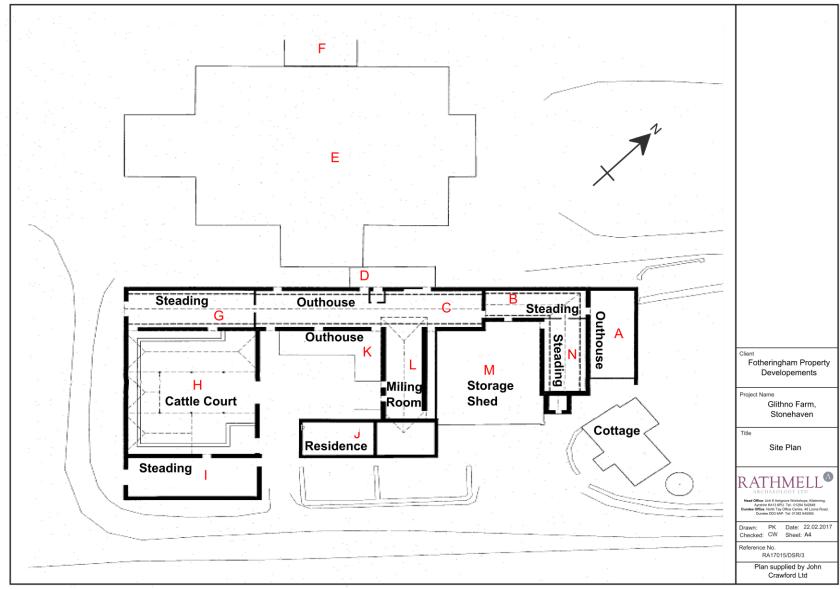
Labelled layout plan of Glithno Farm (provided by John Crawford Ltd 2017).
